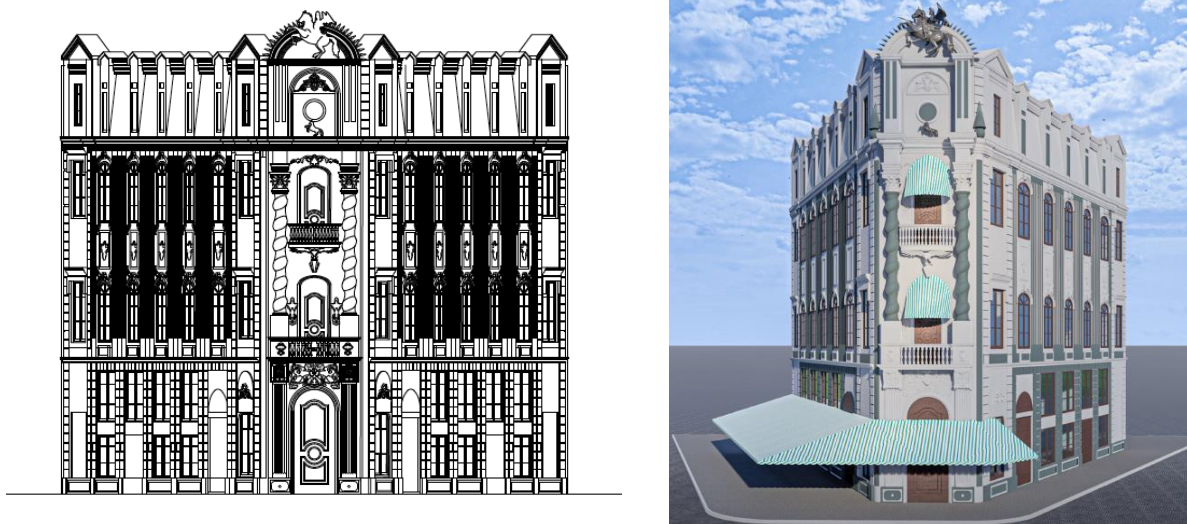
Façade plan and rendered. 3D view of the building (Own elaboration)
